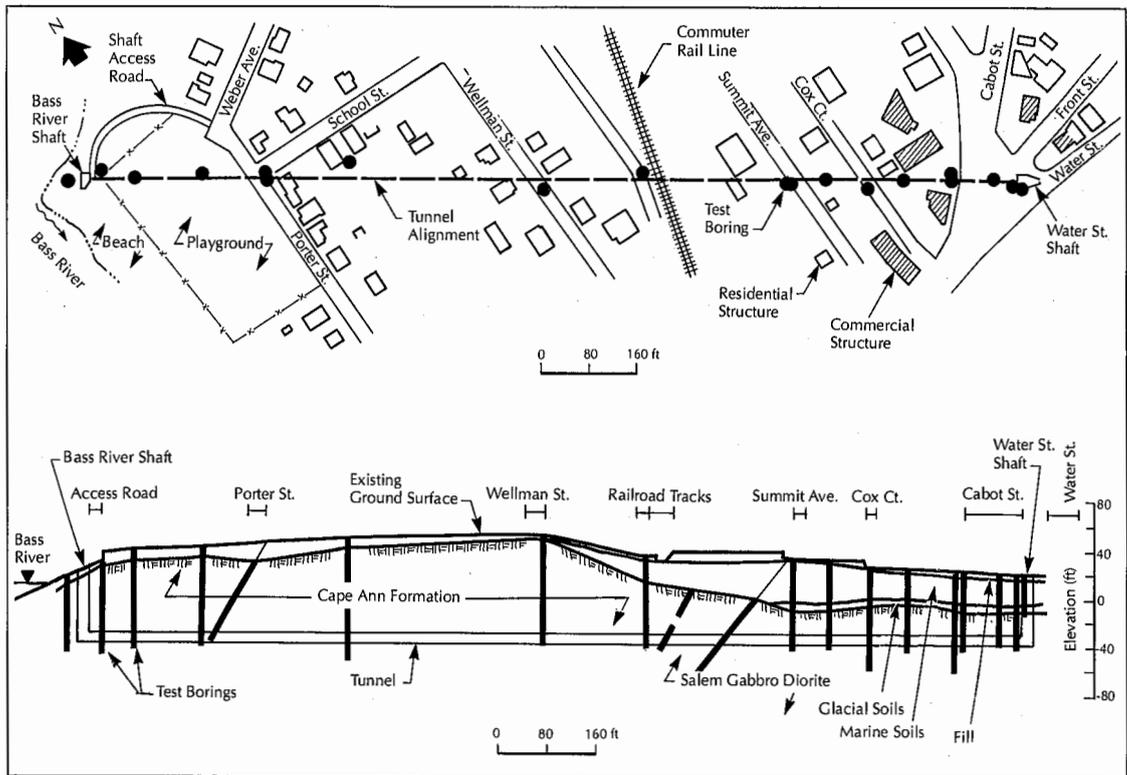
Plan and general geologic section of the Beverly Sewer Tunnel location.
